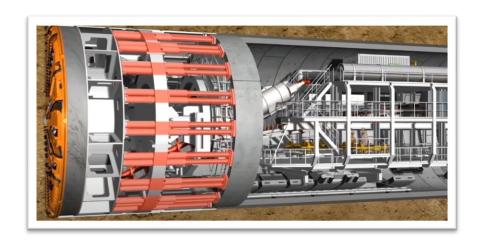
the hydraulic cylinders press the machine forward in the tunnel
